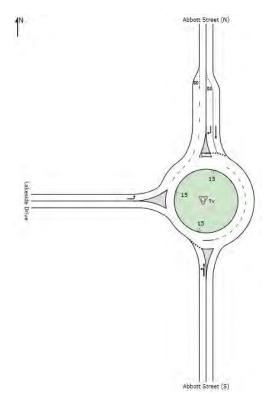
Abbott Street and Lakeside Drive existing layout as modelled
